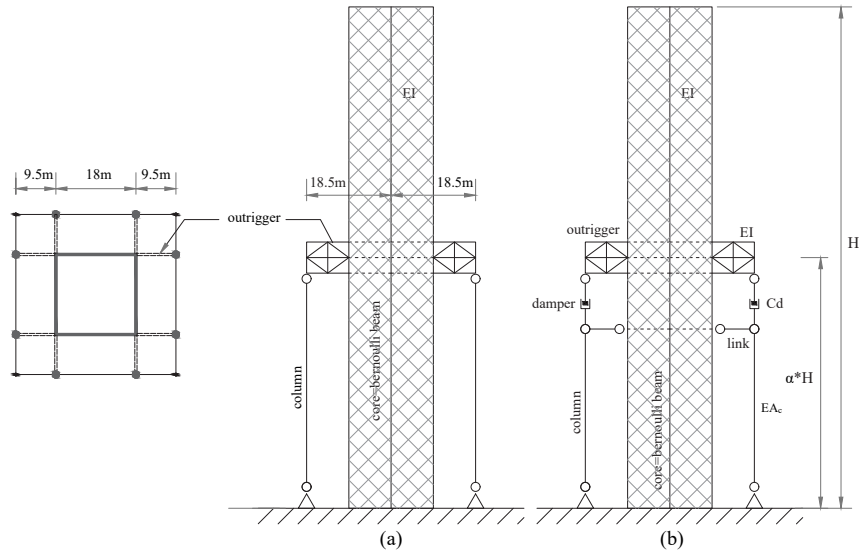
Typical plan for the fixed (a) and damped (b) outrigger building models
